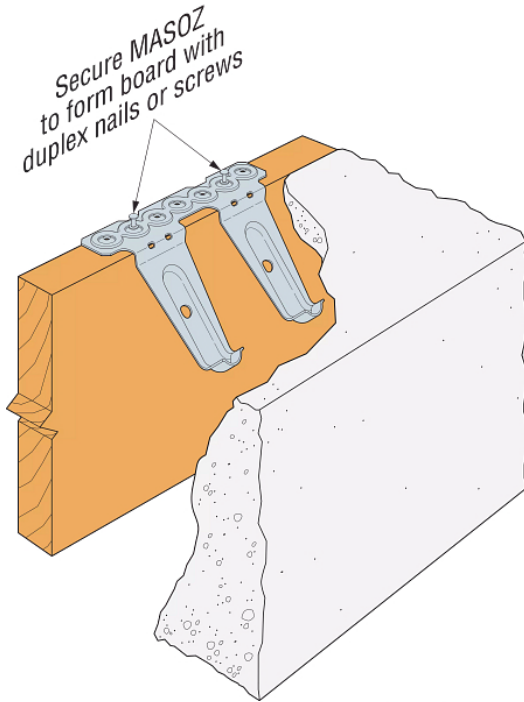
MASOZ FOUNDATION ANCHOR STRAP
